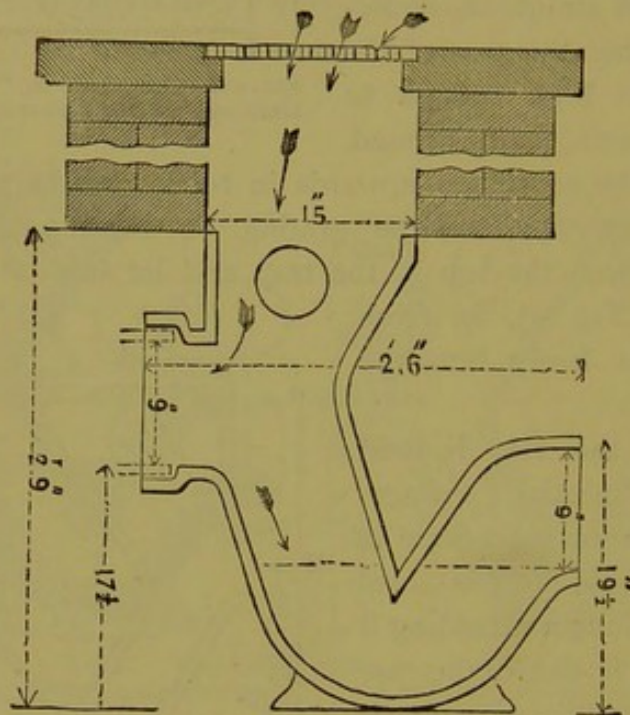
Vertical Section of a 9-in. "Ventilating Drain-syphon," with Brick Air-shaft.
